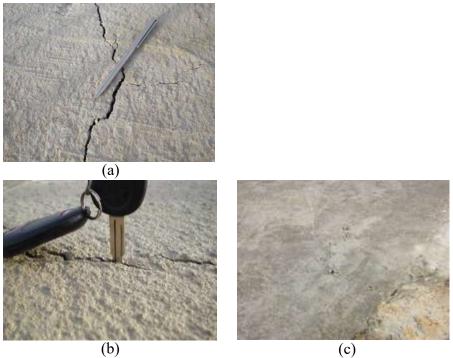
(a) Shrinkage cracks; (b) Shrinkage Crack Width; (c) Bird Foot Prints on Neglected Concrete
